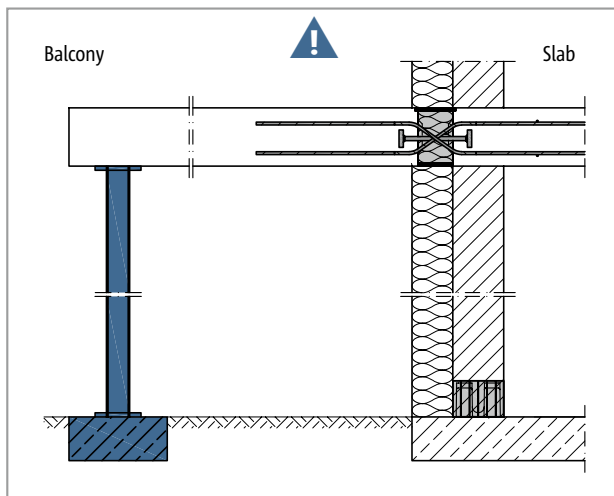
Schöck Isokorb® XT type Q-P-VV: Continuous support required
